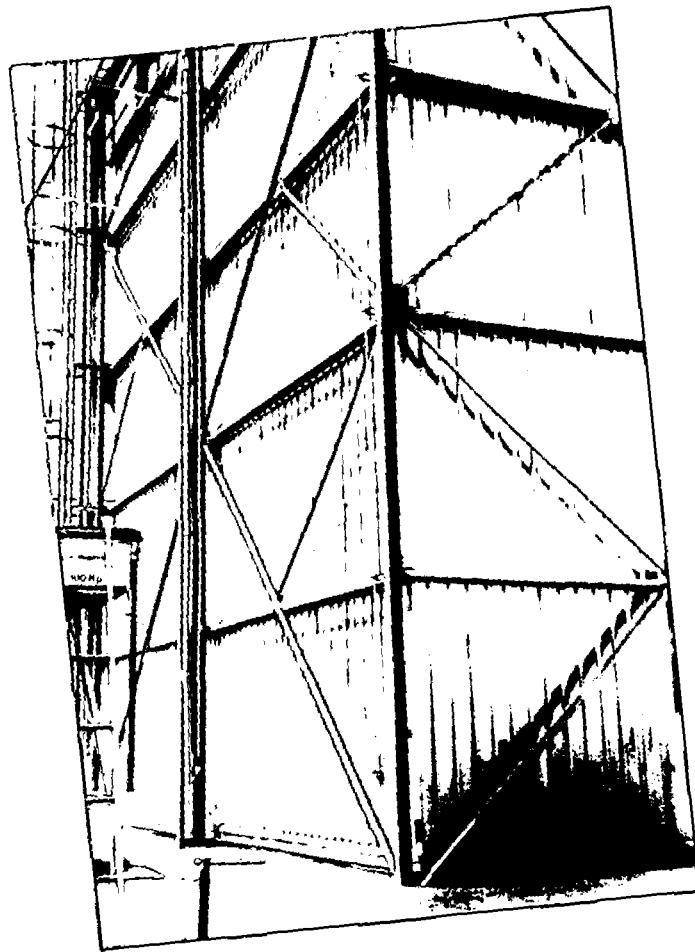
STEEL FRAME CONSTRUCTION AND CLADDING
